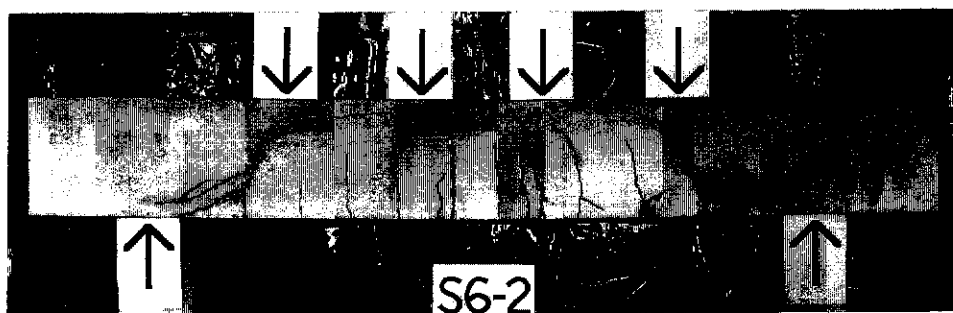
Crack Pattern of the Back Face of Beam S6-2
